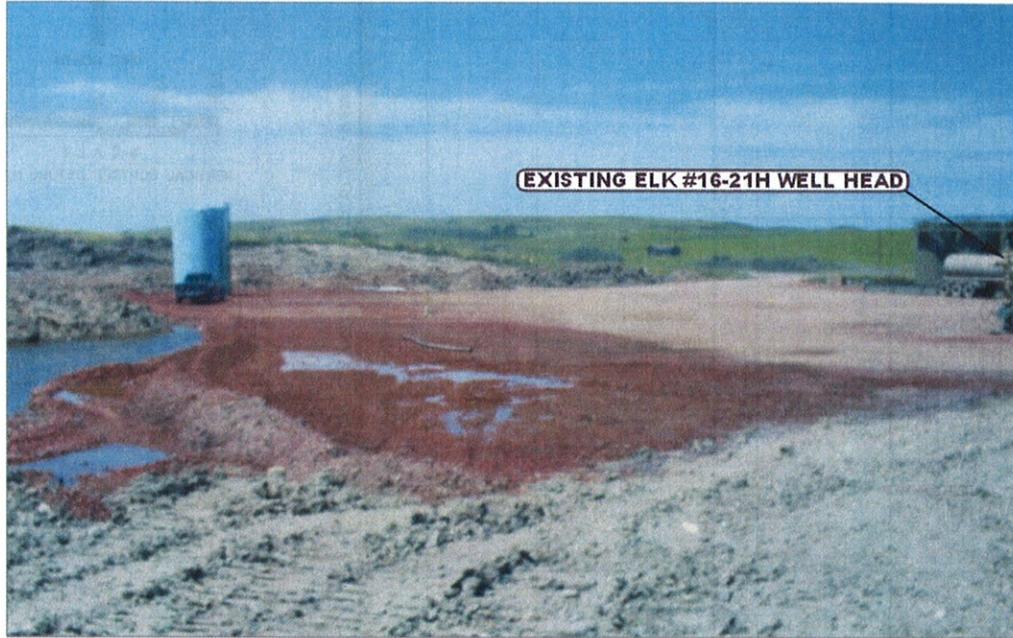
PHOTO: VIEW FROM SOUTHWEST CORNER OF EXISTING PAD
